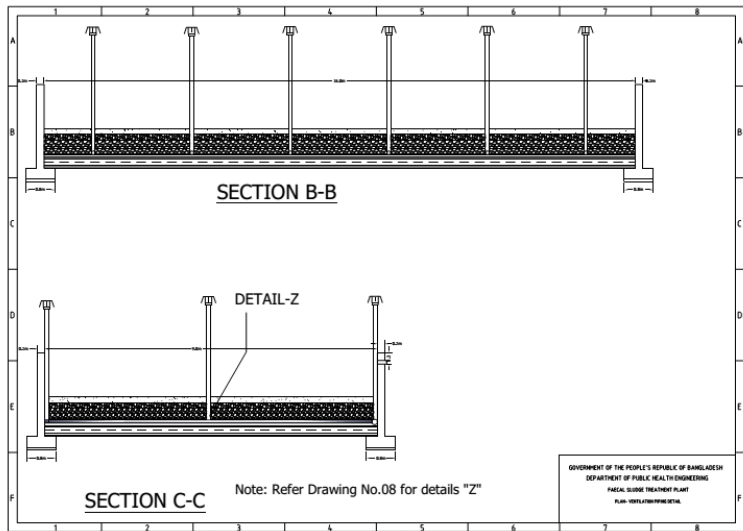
Typical detail of ventilation pipes of Faecal Sludge Treatment Plant
